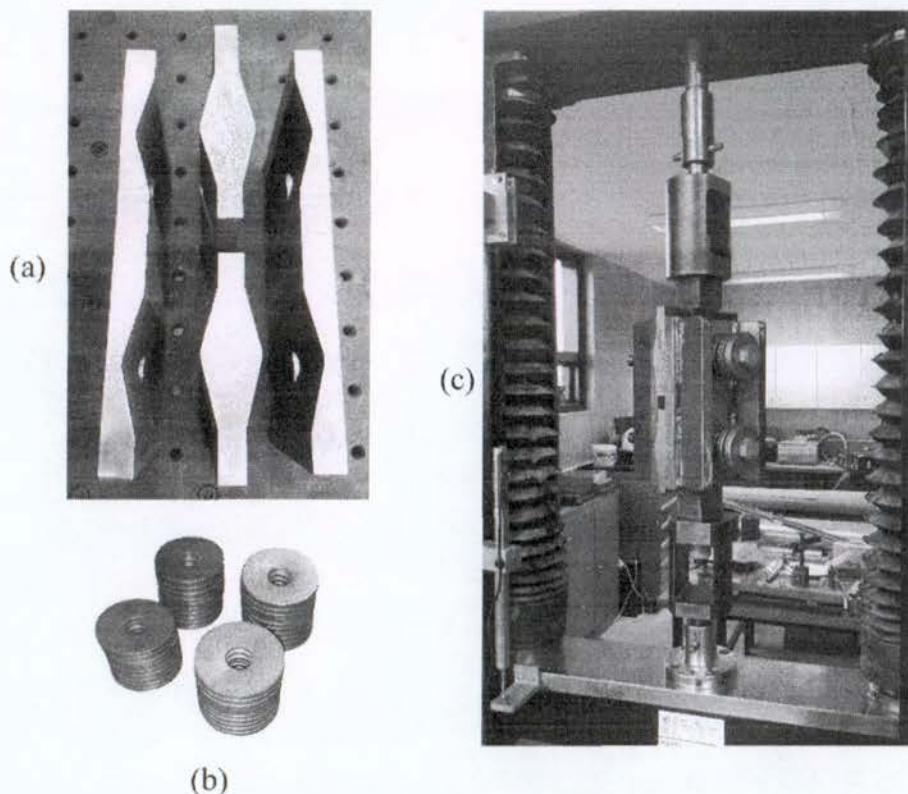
RSF joint component test: a) Cap plates (before attaching the stiffeners) and centre slotted plates b) Belleville springs c) Assembly and test setup.
